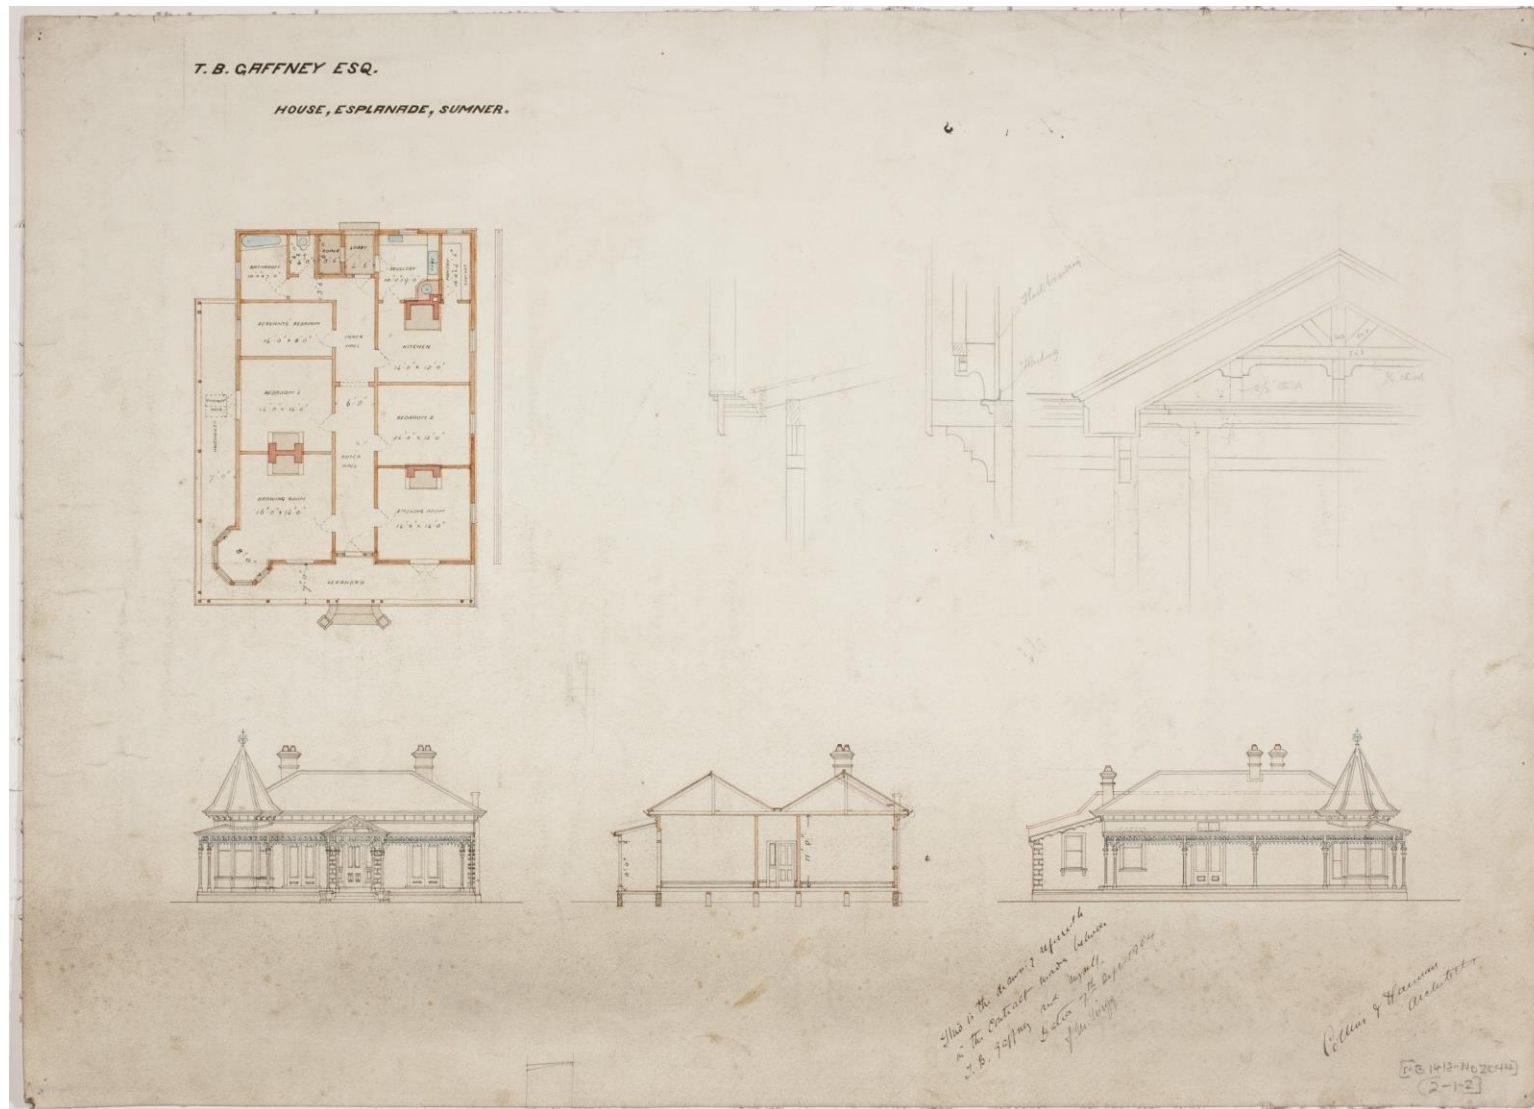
Collins and Harman, T. B. Gaffney, Esq., House, Esplanade, Sumner, plan, elevations, section and details (1904).
